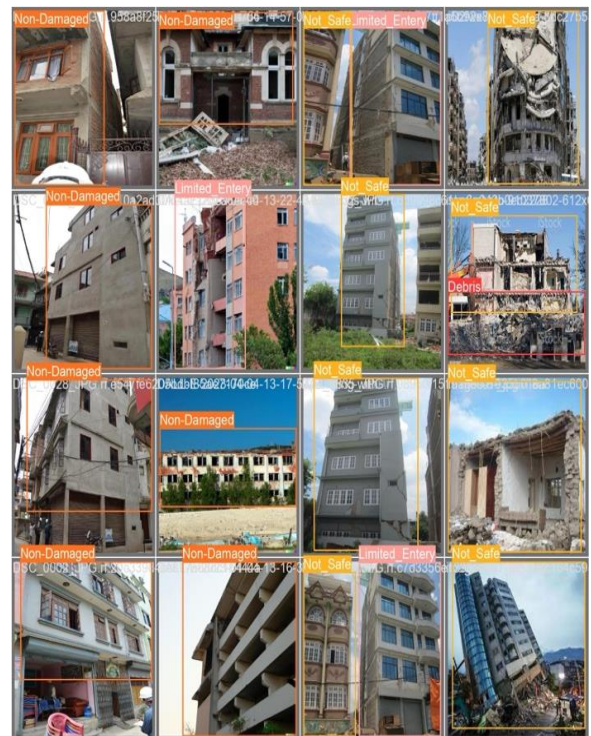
Sample images for Damages Level (Column, Shear wall, Infill wall, Outdoor Damage)
